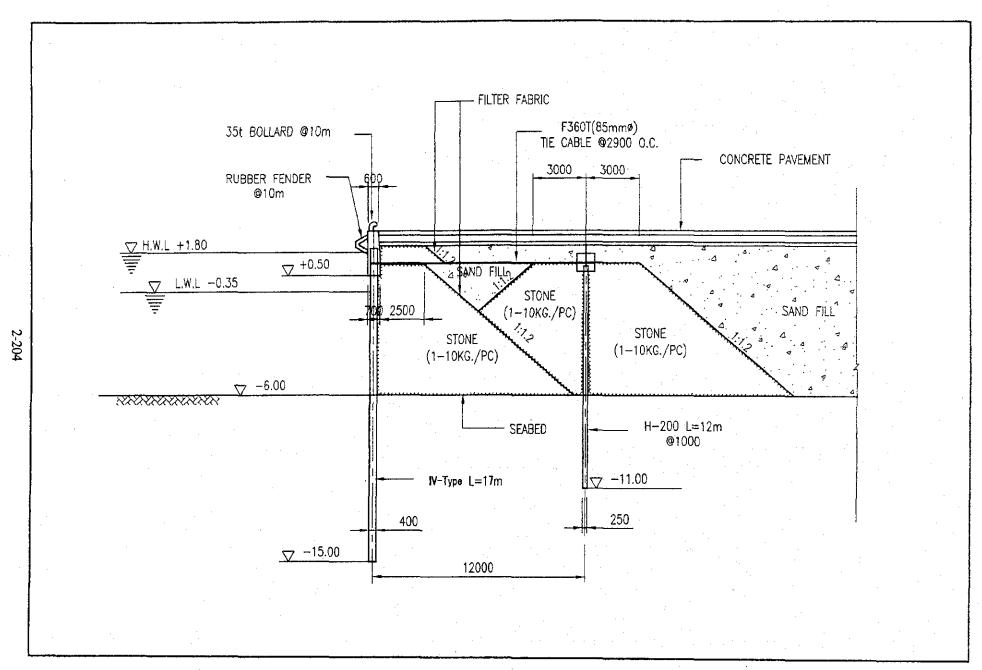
Sheet Pile Type Quaywall for Toledo Port
